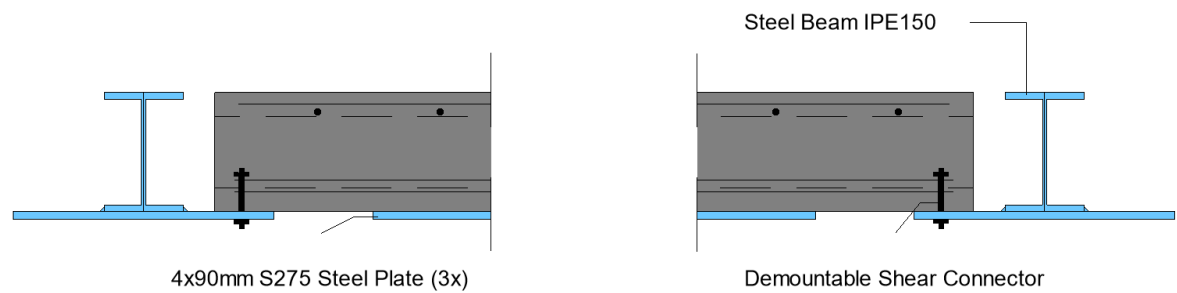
Hollow Core Slab With Intervention Technique Steel Plate Bonding Front View
